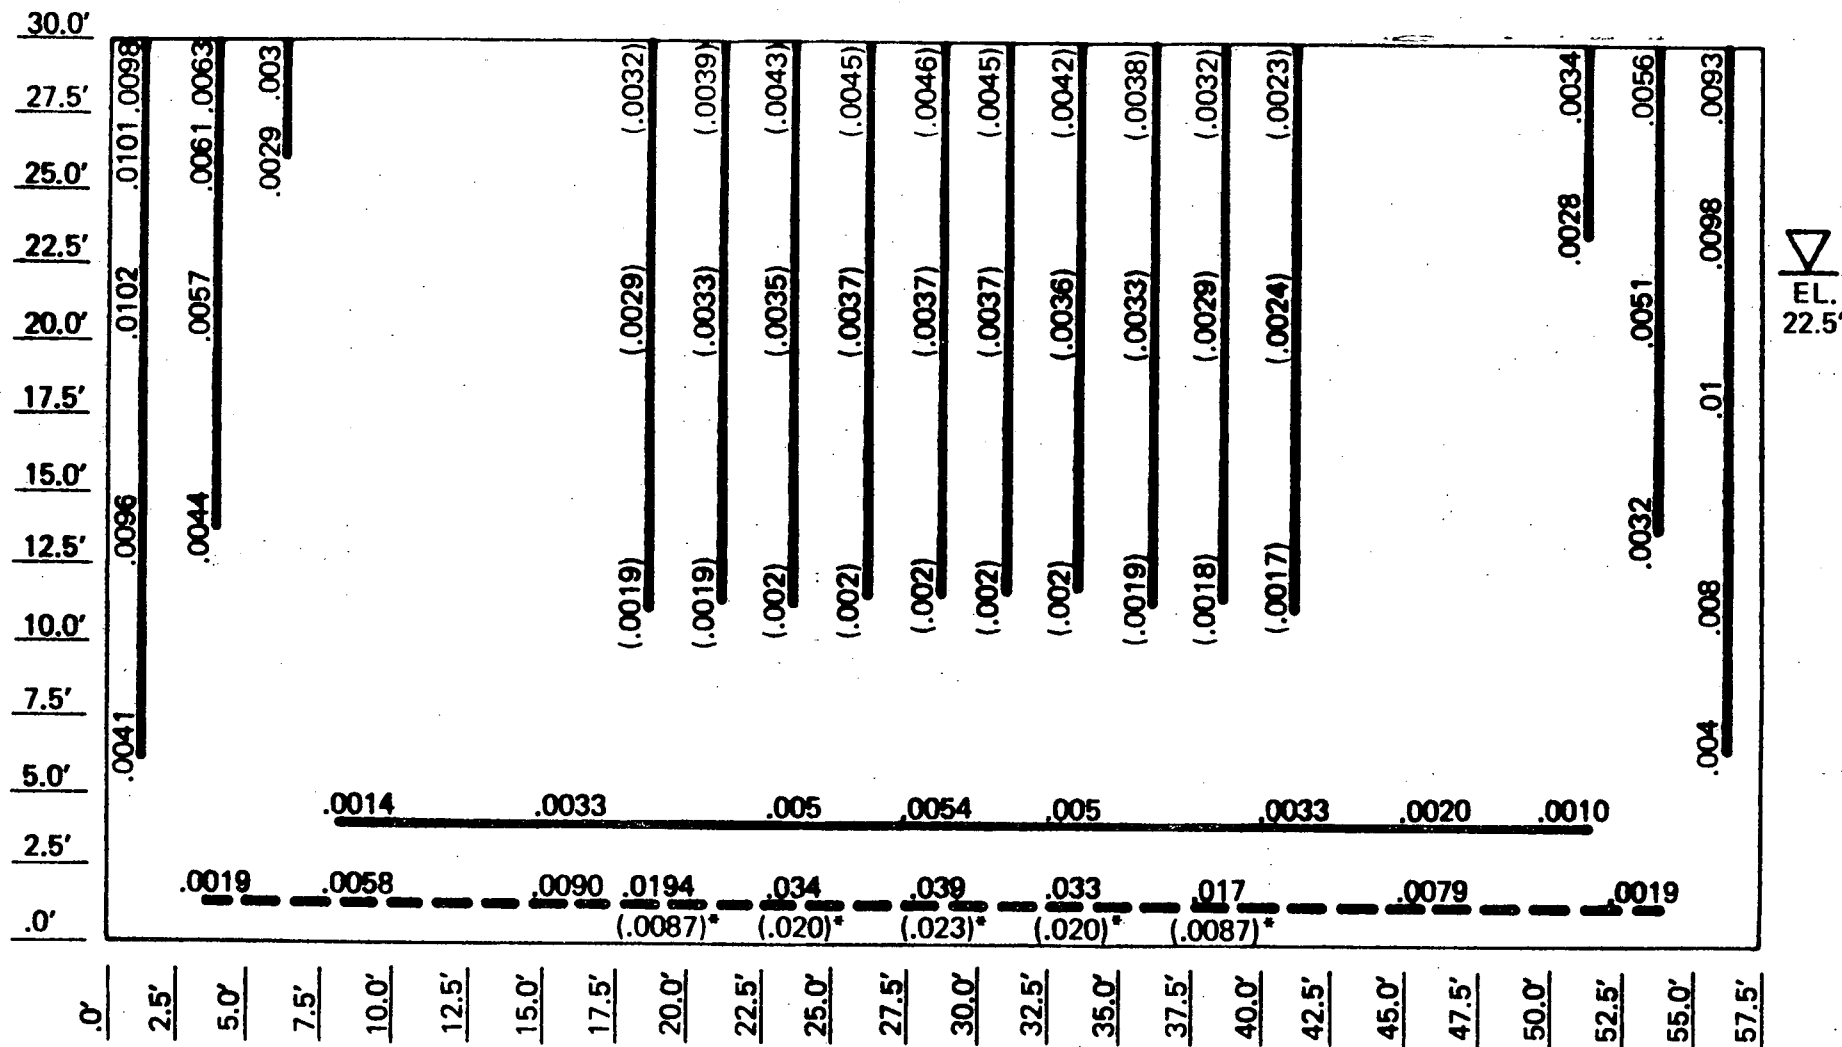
CONDENSATE STORAGE TANK AREA WALL-1
